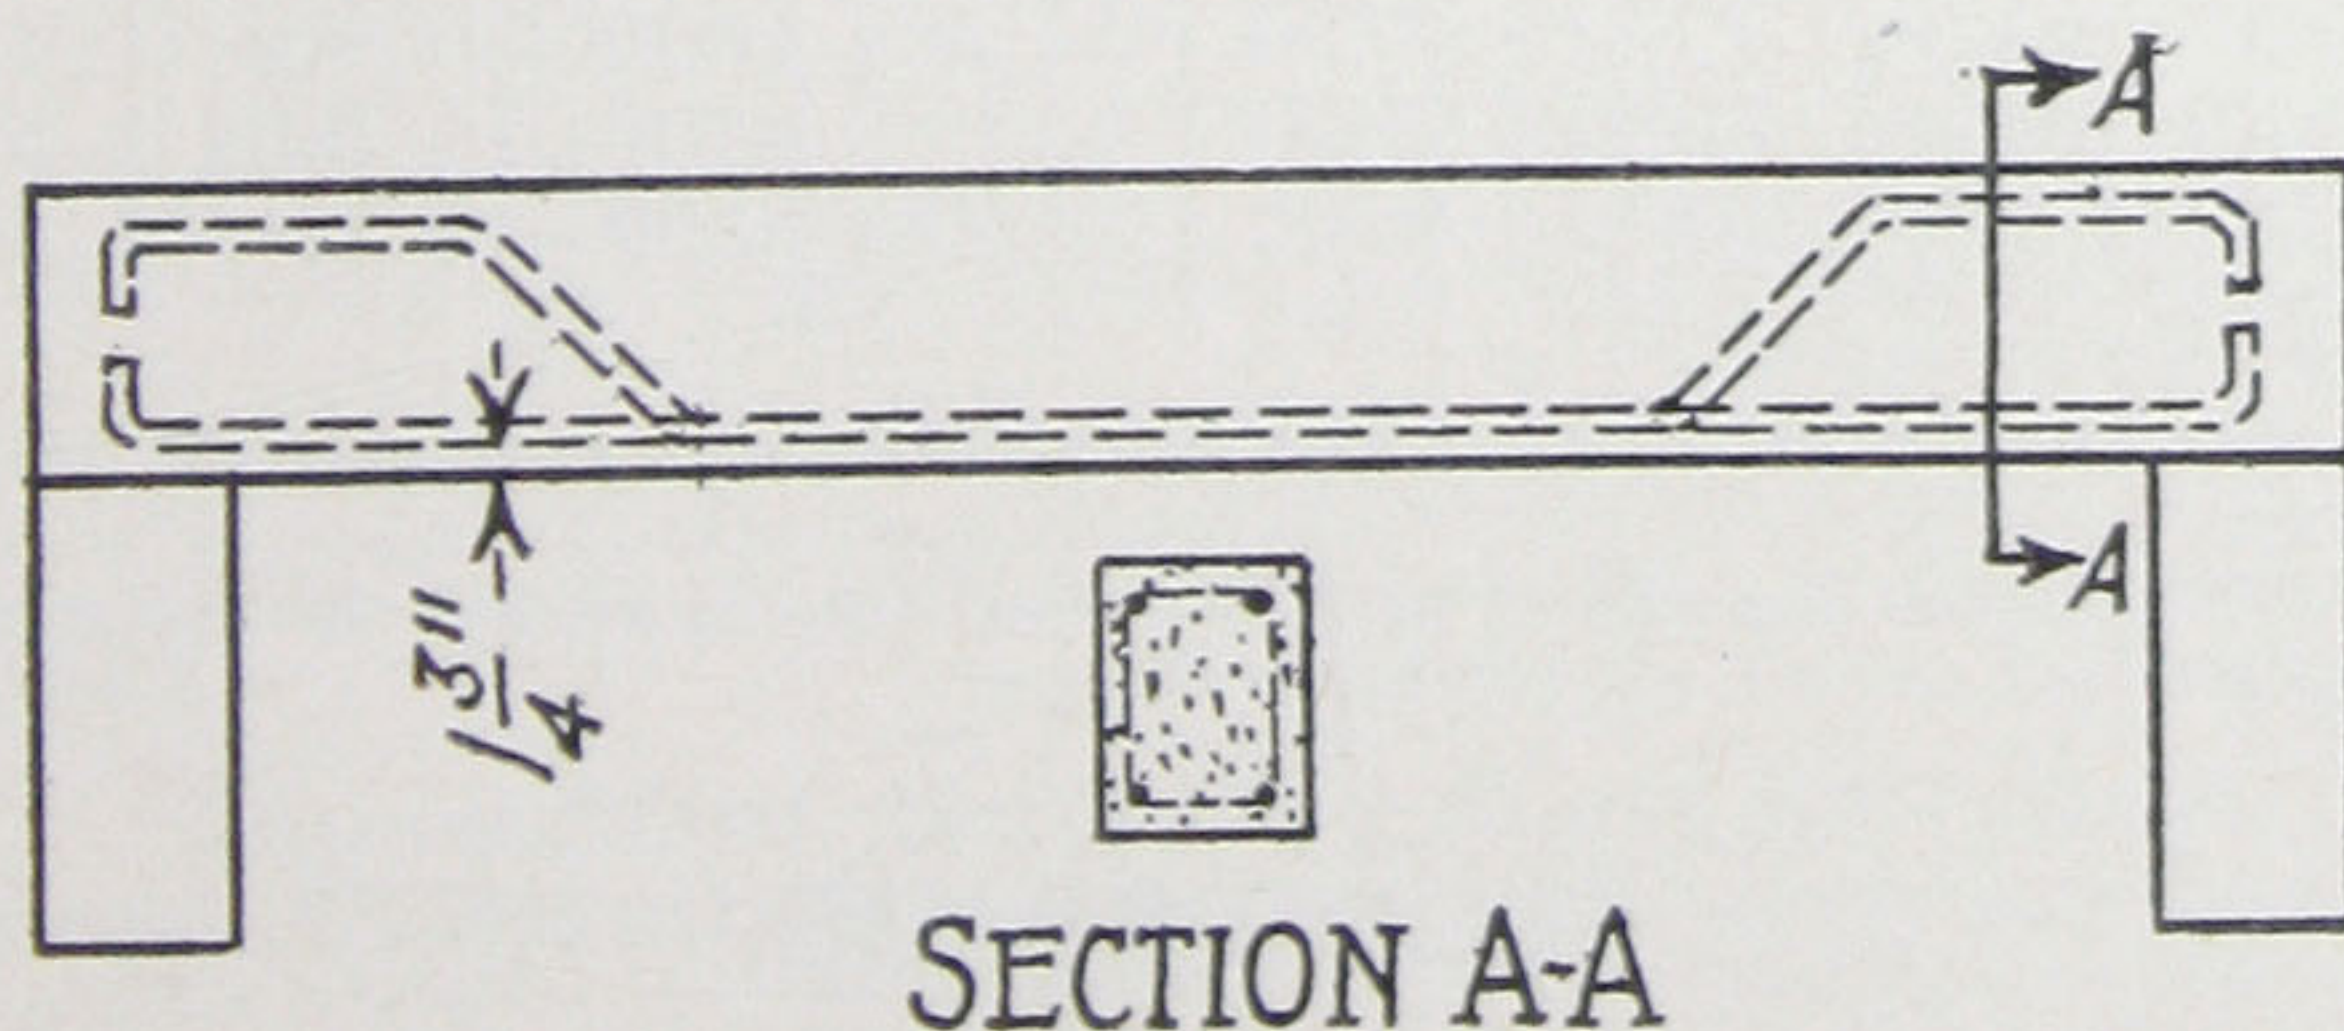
Typical reinforcing for concrete beam. Only the main reinforcing is shown. In actual practice stirrups are installed as shown in Figure 32.
